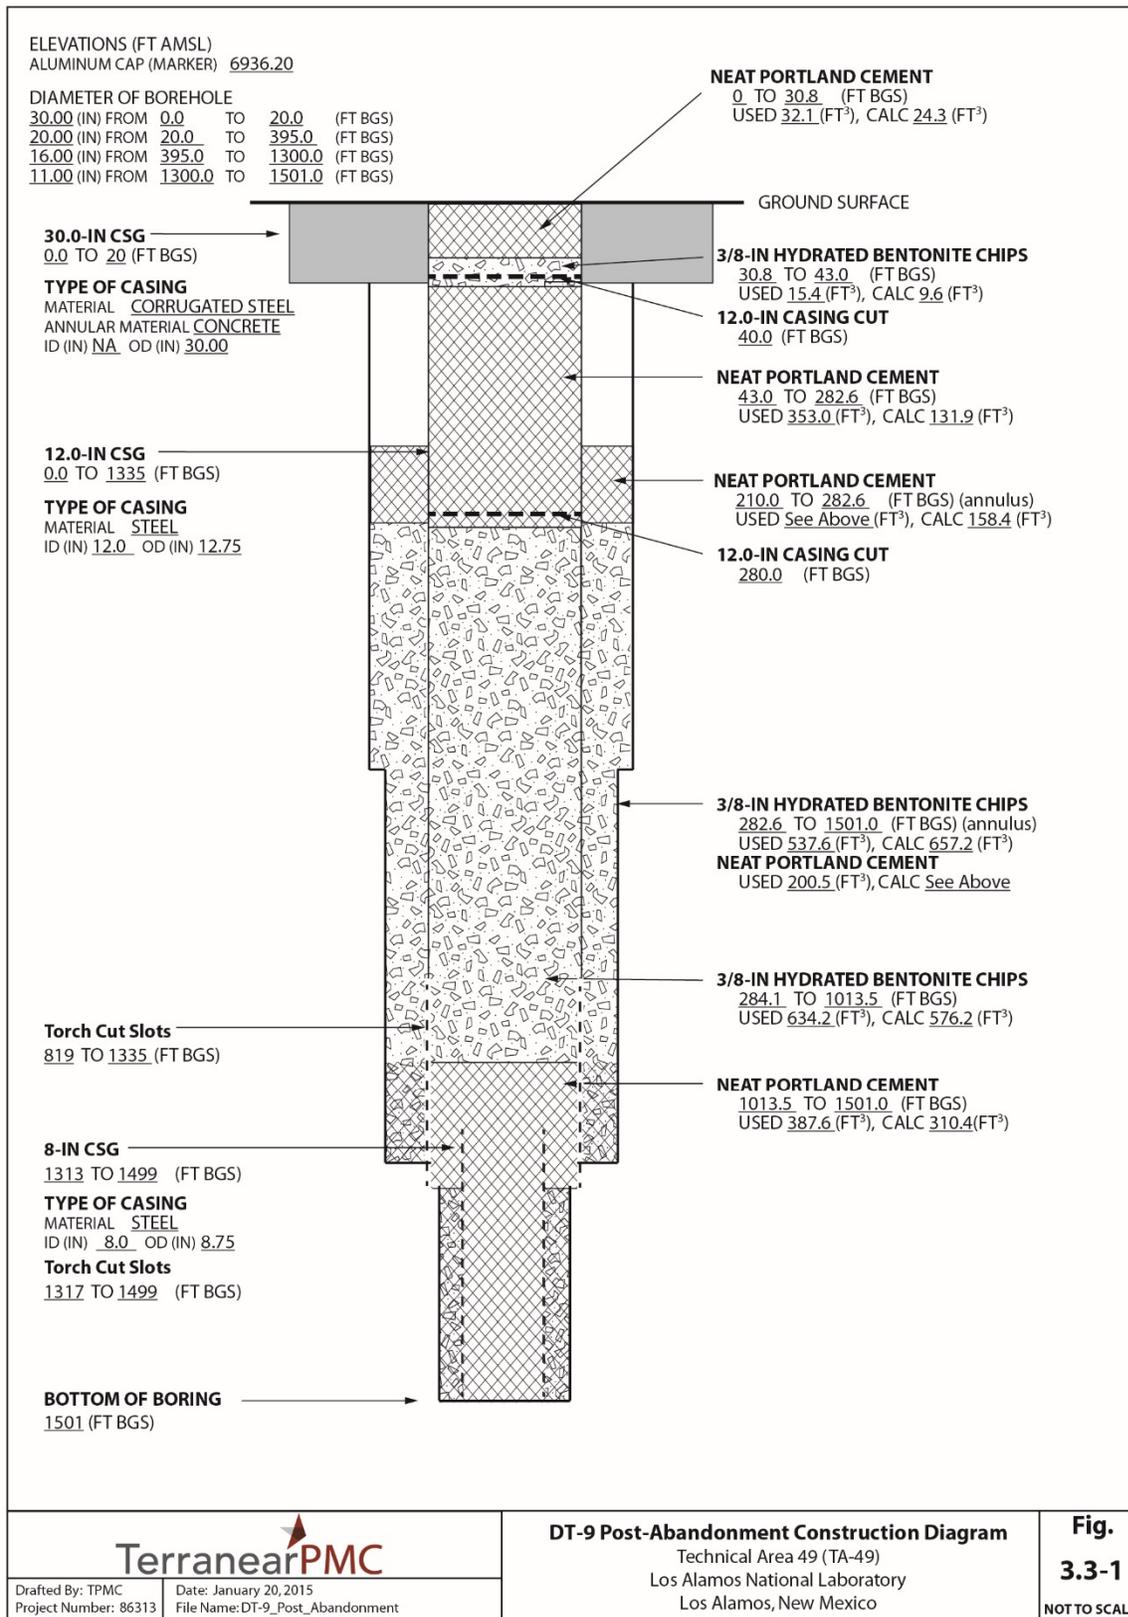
Test well DT-9 post-abandonment construction diagram
